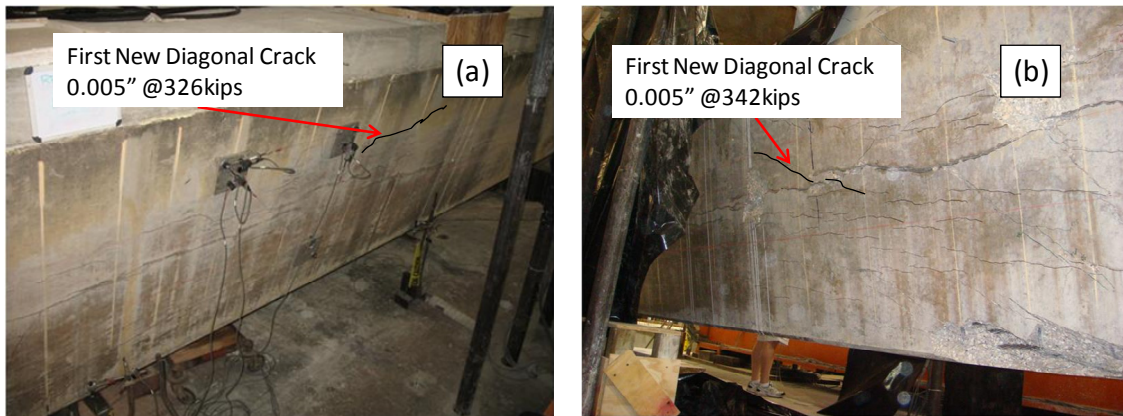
Location of first new diagonal cracks (a) West side (b) East side
